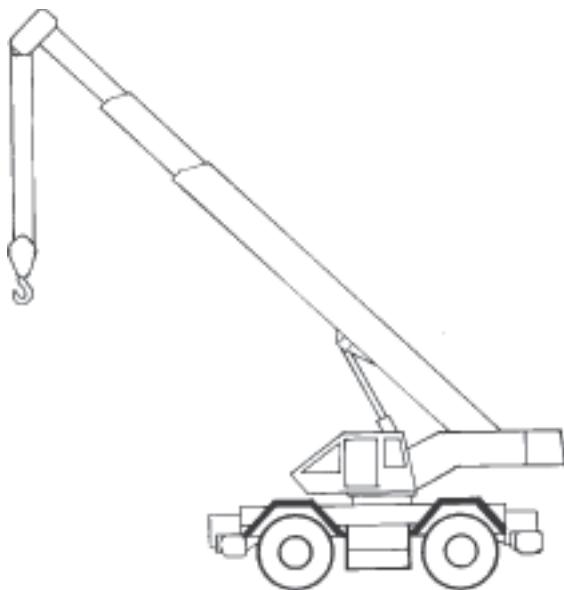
Wheel-mounted telescoping boom with slewing upper structure
